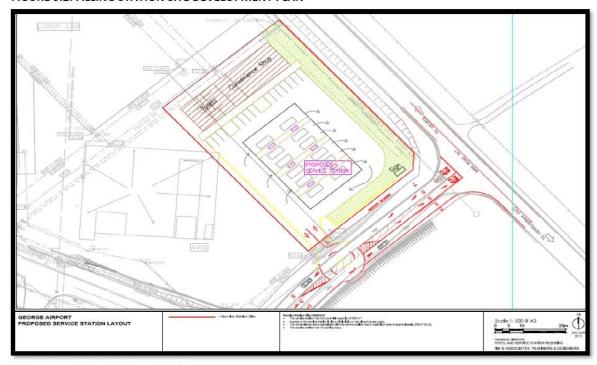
FILLING STATION SITE DEVELOPMENT PLAN
